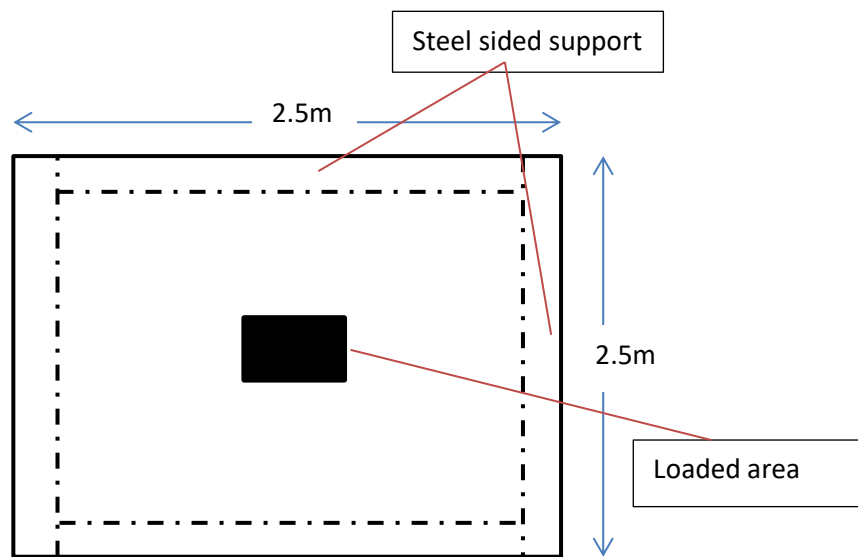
Example layout of simply supported slab in the laboratory test samples.
